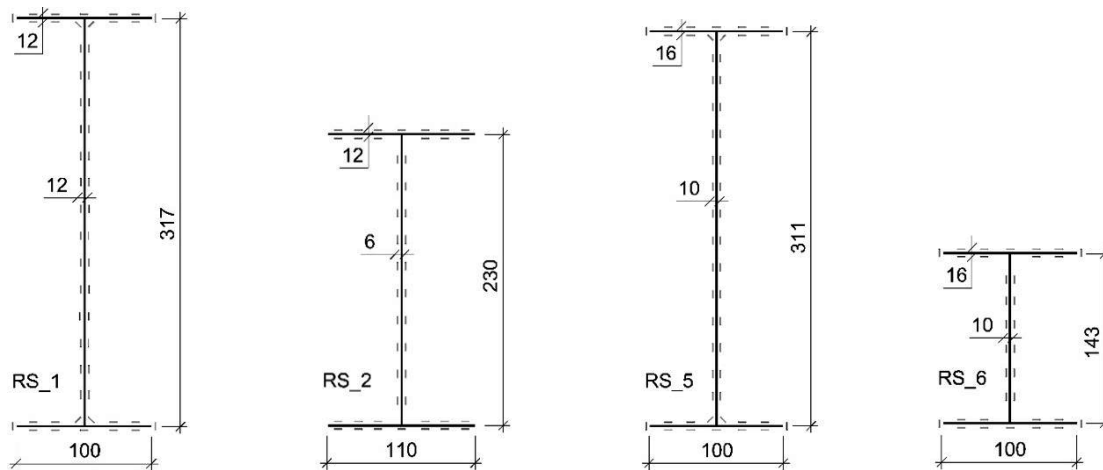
Specimen dimensions and strain gauge arrangement
